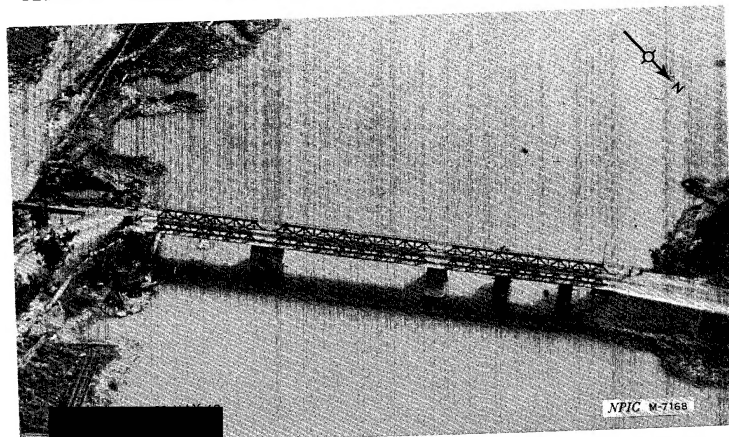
HALPHONG RAILROAD AND HIGHWAY BRIDGE OVER THE SONG TRAM BAC
